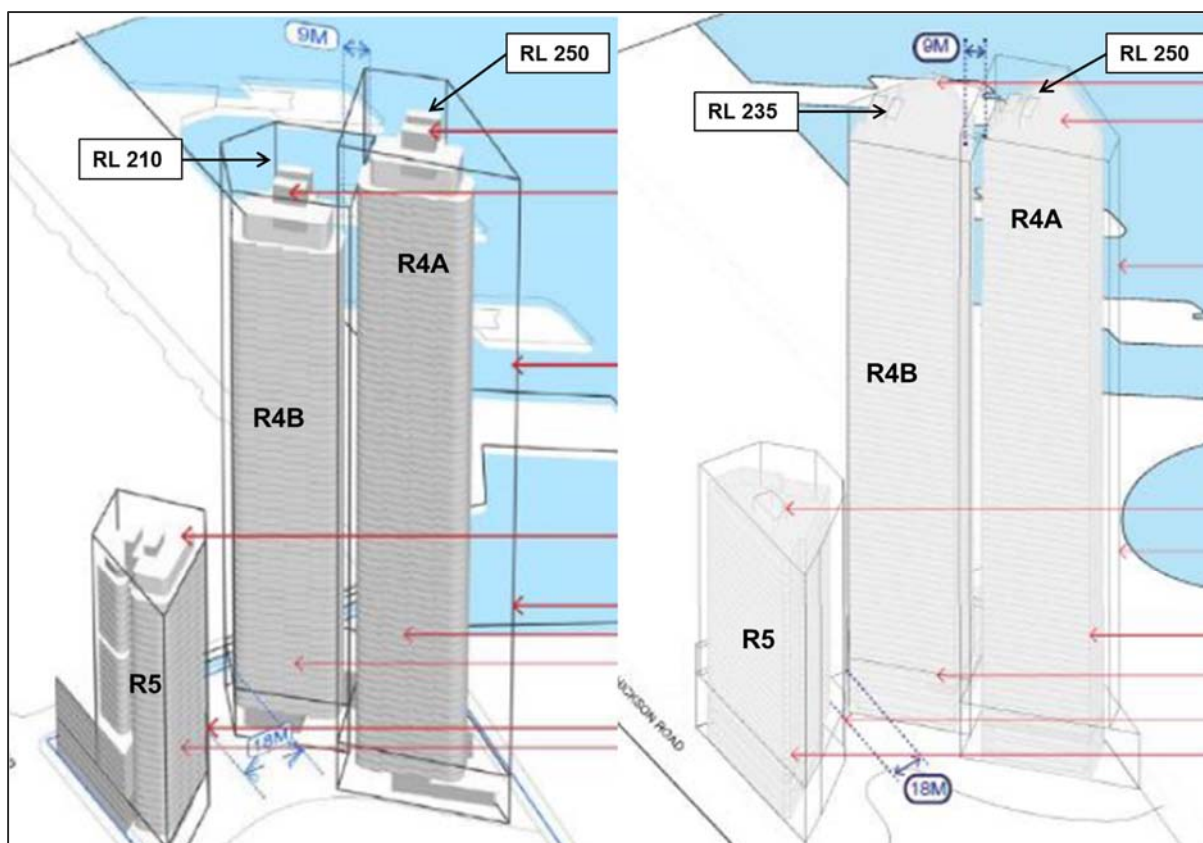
| MOD8 (left) and the proposed (right) maximum building envelope heights of Building R4A and R4B
